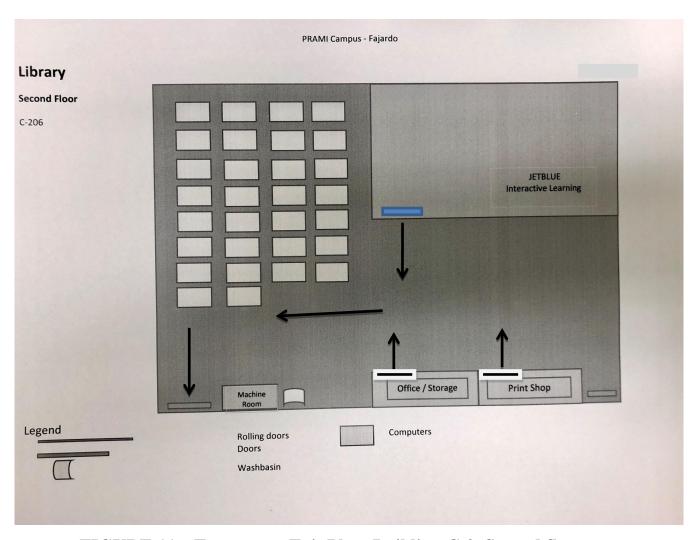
Emergency Exit Plan, Building C-2, Second floor JetBlue Interactive Space and Library – C-206
